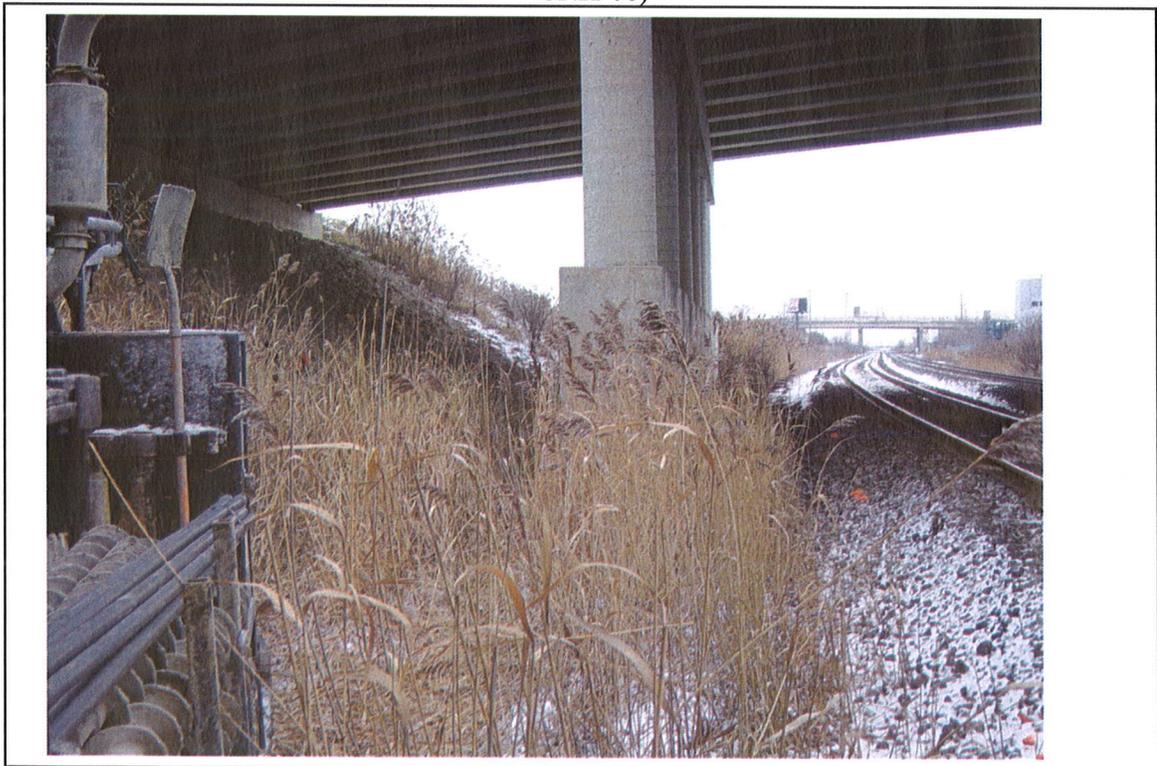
Looking at the existing north abutment and pier, Hwy 427 NBL (Boreholes CNH-03 and CNH-07)
